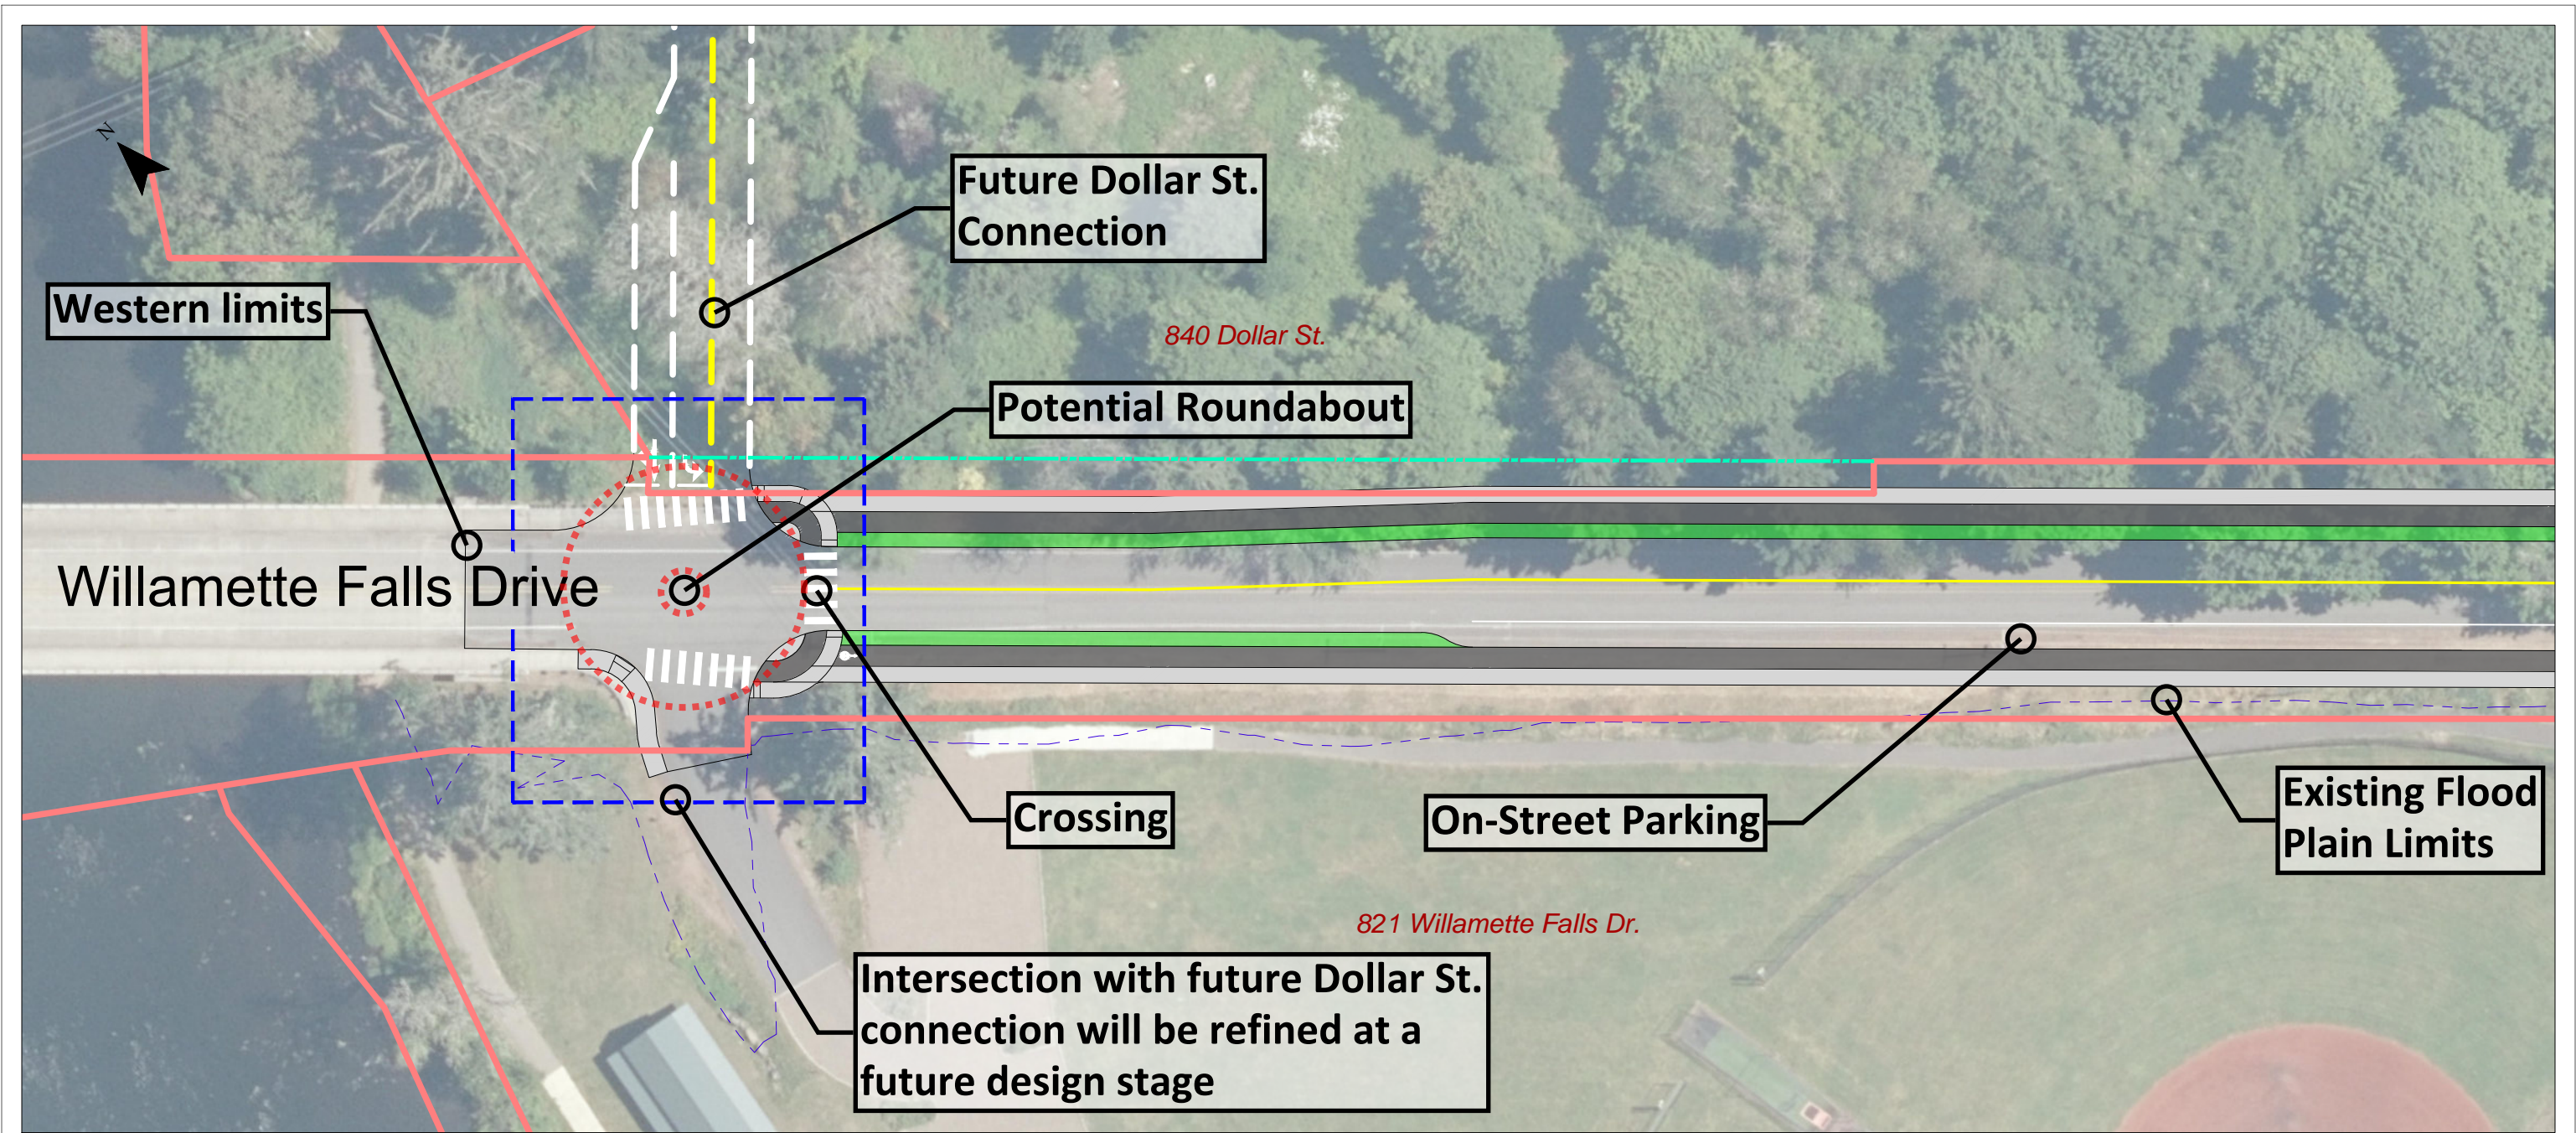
Segment E of 2021 Plan: Stretching from West A Street to I-205
